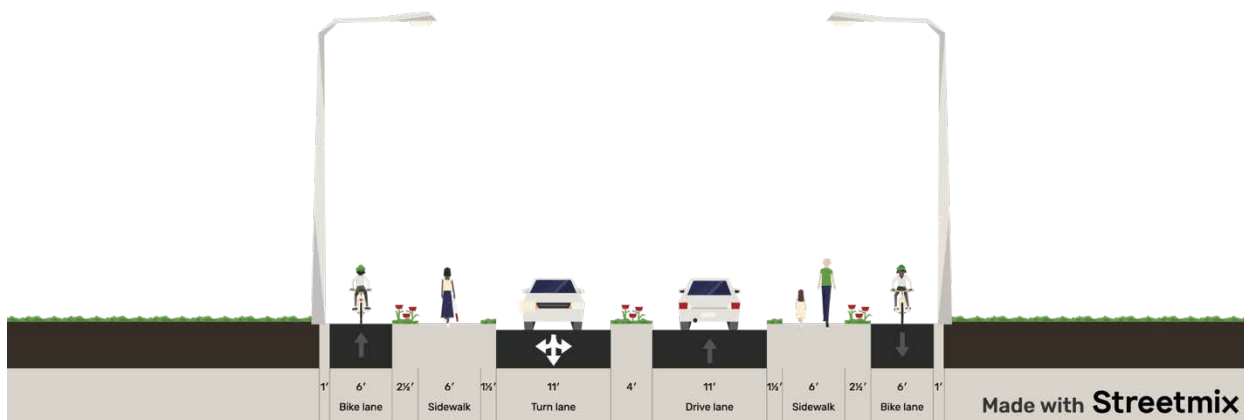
Sidewalks and bike lanes are on both sides of the street. A stop sign will be required within the park where Cloverdale Drive and the new bike lanes intersect with Tide-to-Town. Bike boxes can be used so that bikers can move in front of stopped cars to indicate that they will be turning, which is ideal for making bikers visible to drivers. Diagram created in Streetmix by EC, 2022.
